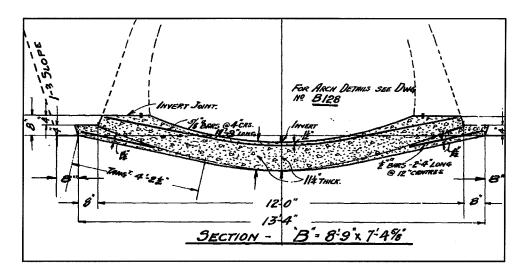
Widened and reinforced invert slab used in 1916 on all questionable foundation soils. (from GWWD Drawing D-334)
